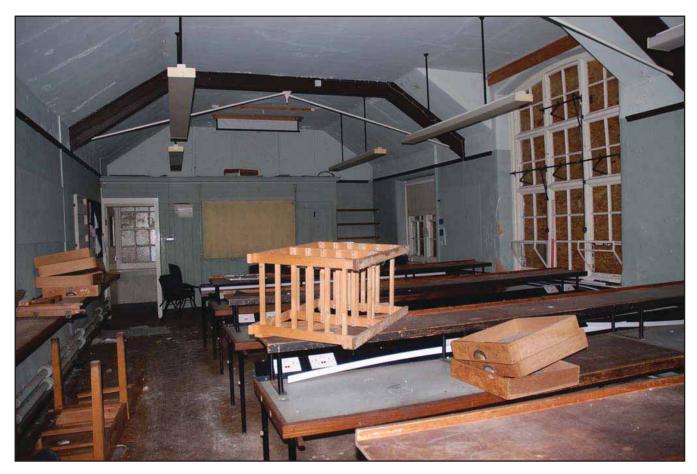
Detached north building First Floor Room F01 - general room shot looking east. Scale: 1.0m
